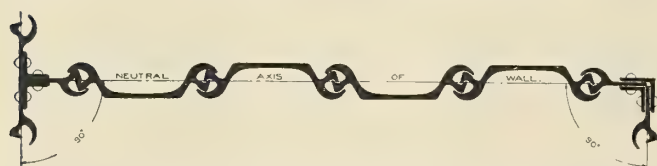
LACKAWANNA ARCHED WEB STEEL SHEET PILING ASSEMBLED
